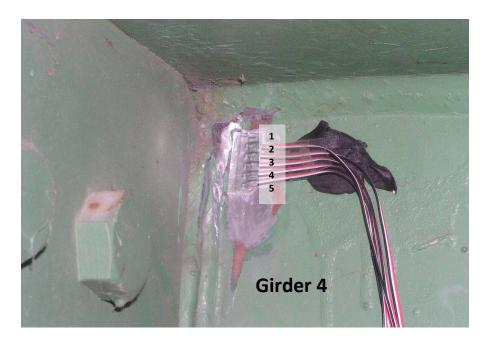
Typical gradient strain gage mounted on the inside faces of Girders 1 and 4 at Pier 3. Note the intersection of the vertical stiffener welds with the horizontal plate girder welds. The gradient was placed as close to the vertical and horizontal welds as possible. They are oriented to measure out of plane strain in the girder web.
